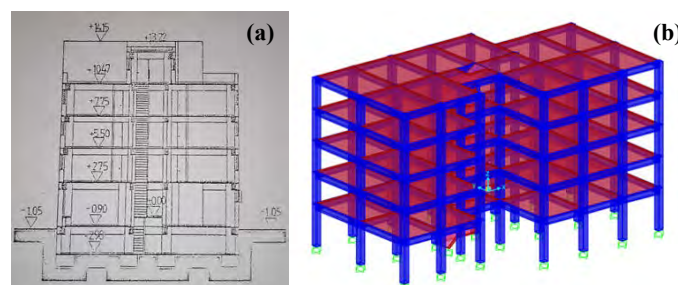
Building C3e1 (a) transverse section; (b) structural model from SAP2000
